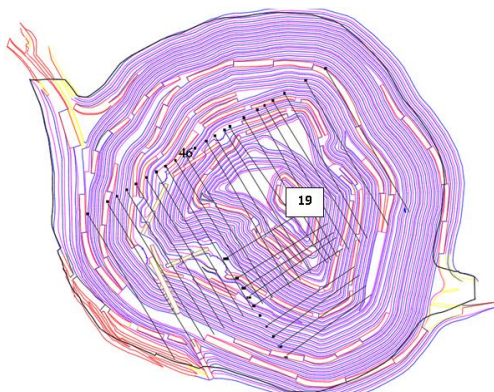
Plan of mining the Kacharsky open pit with the plotted section line #19
